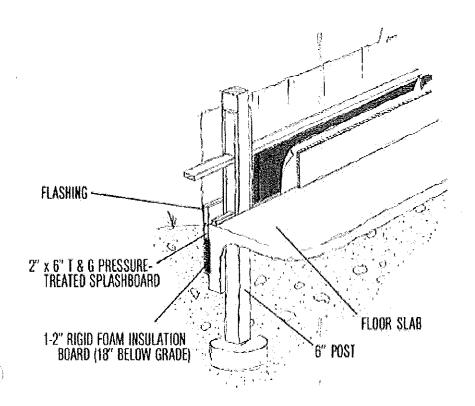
Foundation perimeter insulation-post construction (R=2.2). Perimeter insulation of a pole foundation may be accomplished by using 2-inch thick, pressure-treated splashboards and rigid insulations as forms for pouring the concrete foundation between posts, then leaving them in place. Soil must be backfilled and lightly compacted to hold the insulation and splashboards in place before pouring.
